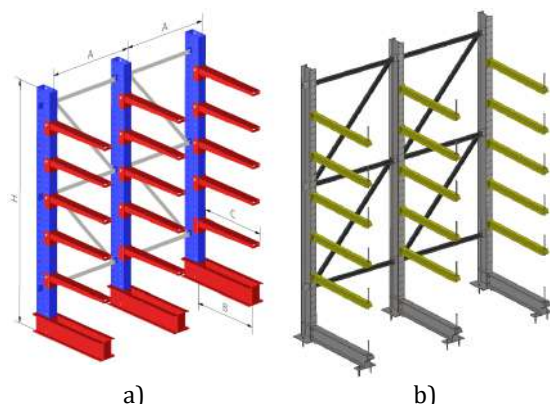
Single sided cantilever rack made of: a) cold formed profiles, b) hot rolled profiles
